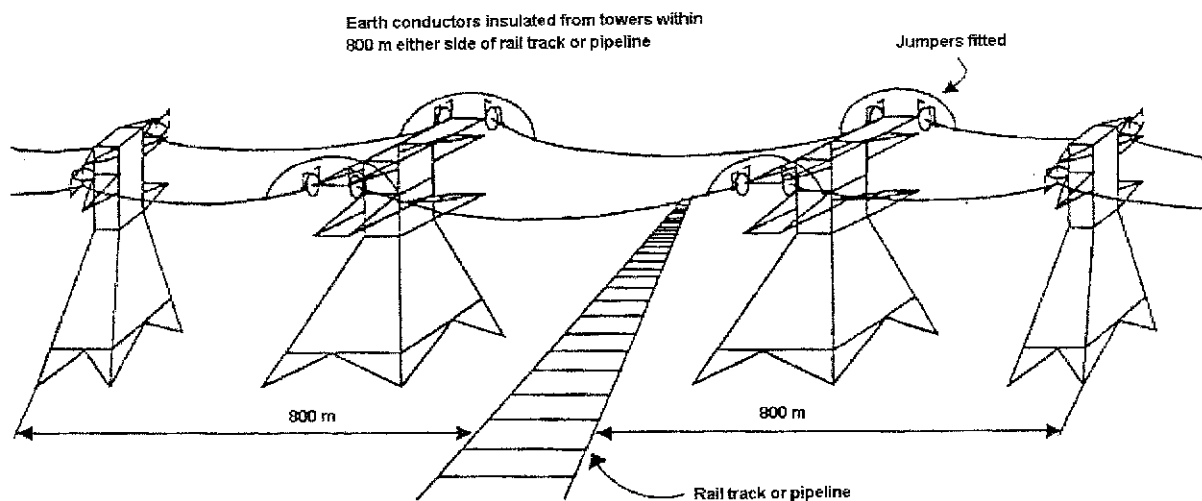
B – Insulation of earth conductors on suspension and strain towers crossing rail tracks or pipelines
